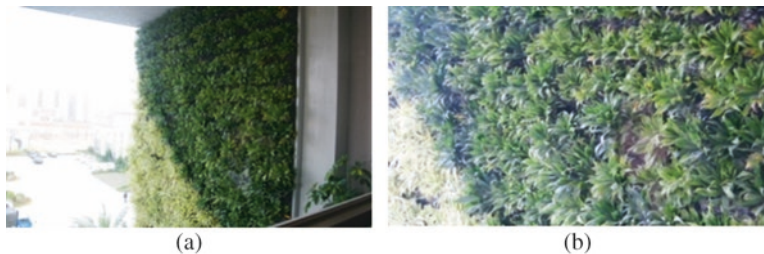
Green wall “rotating building” design adopted in the Tianyi construction project. (a) Use of a spatial illusion to create “rotating walls.” (b) Irrigation system
